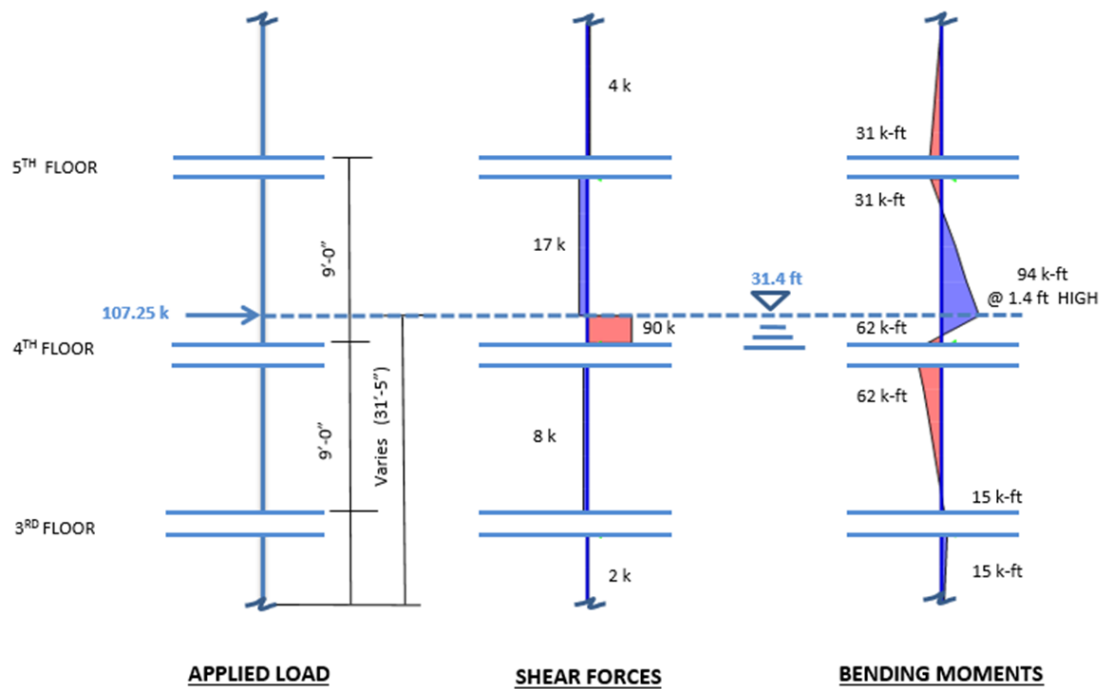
Impact load applied at 1.4 ft away from the assumed lateral restraint instead of the mid-height of the assumed lateral restraint points at top and bottom of the 4th floor column
